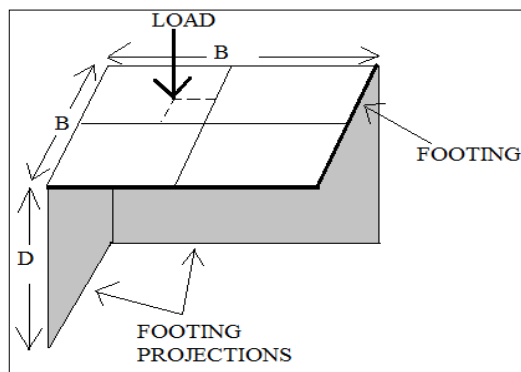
3d Diagram of Bi-Angle Shaped Footing Subjected to Two Way Eccentric Vertical Loading.
